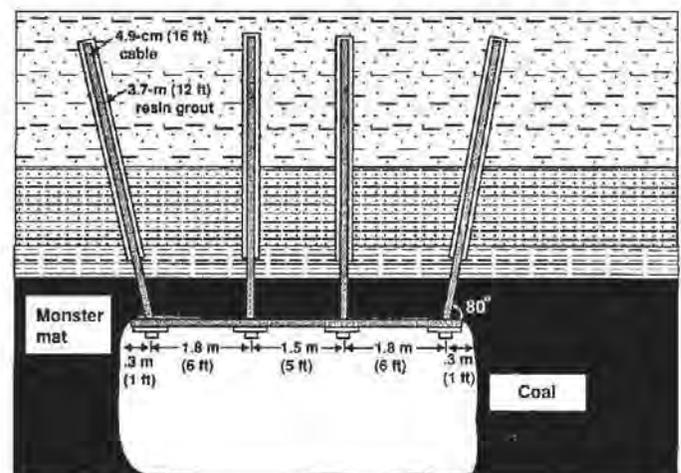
Generalized cross section of the cable spacing and lengths used in the gate road test areas.
